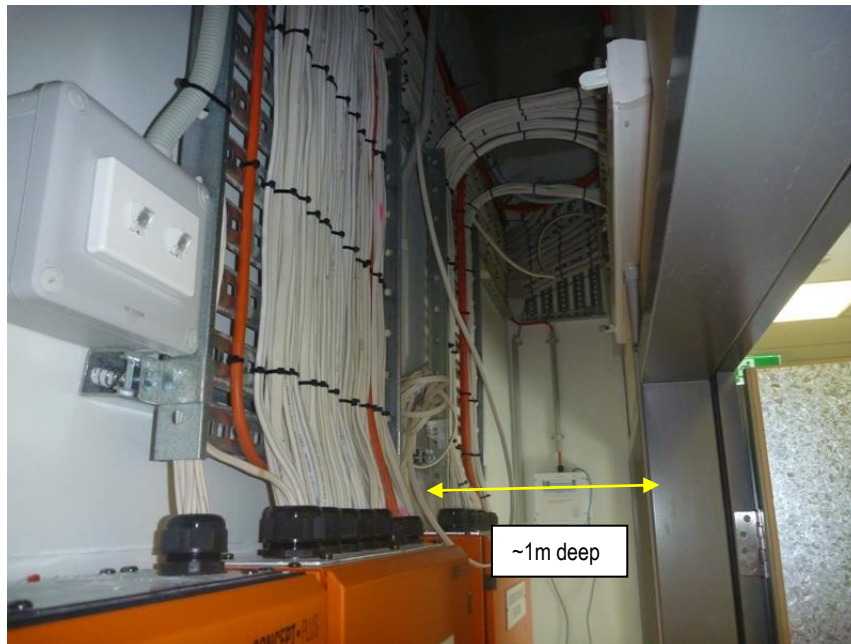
Typical EDB cupboard – photo 2 (Interior)
